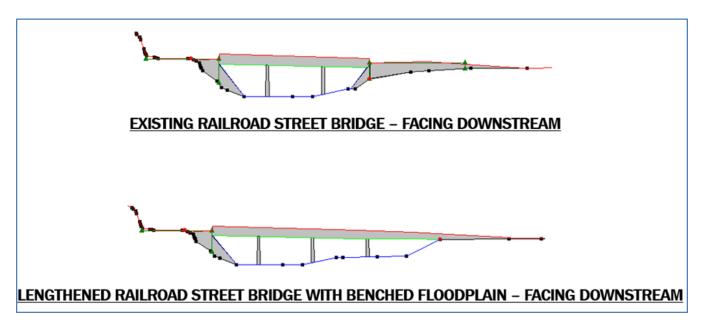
Existing Railroad Street Bridge and Proposed Modifications
